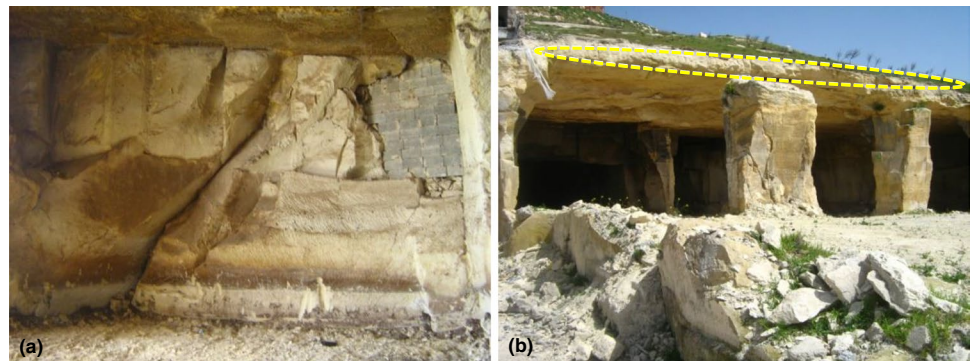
General views of opening 5. a Before the collapse, b after the collapse
